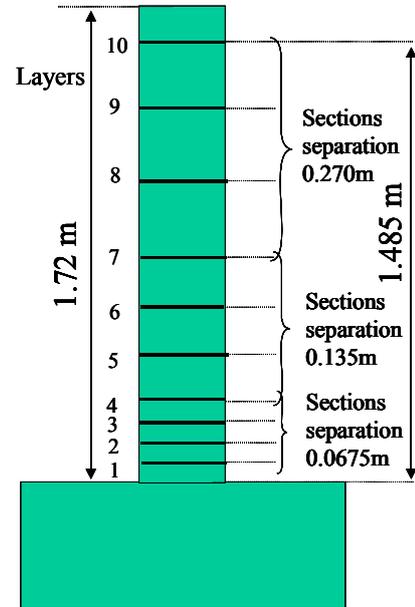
(b). Column Dimensions and Fiber-Optic Layout
